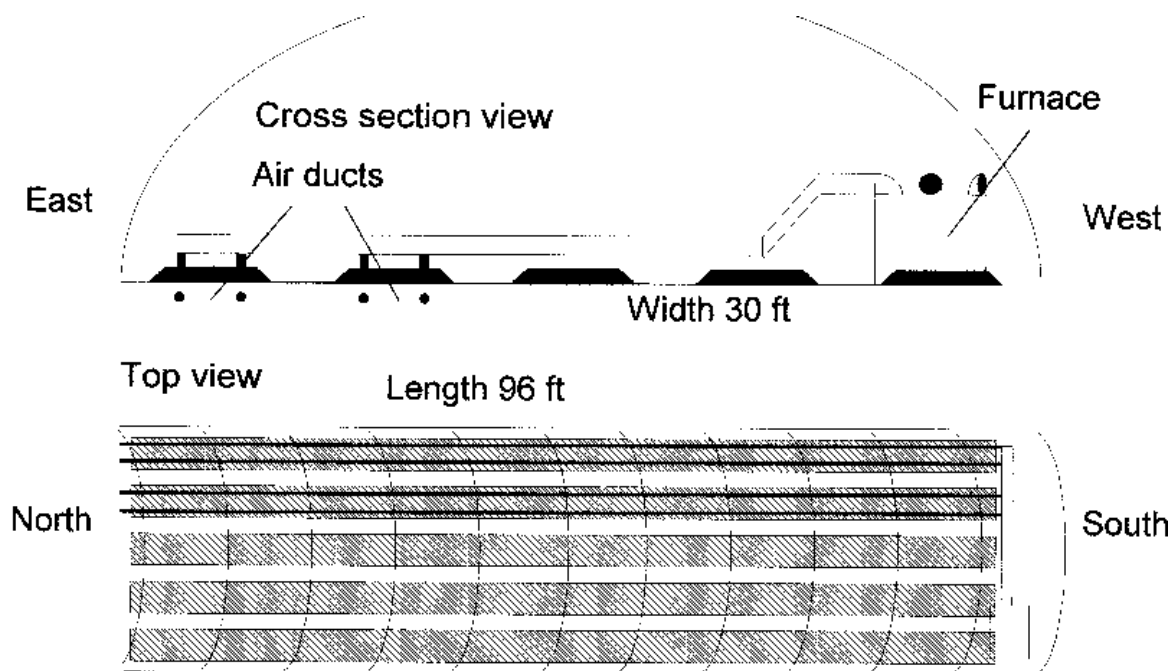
A schematic diagram of a greenhouse with a forced-air furnace connected to buried drainage pipes used to heat the soil.
